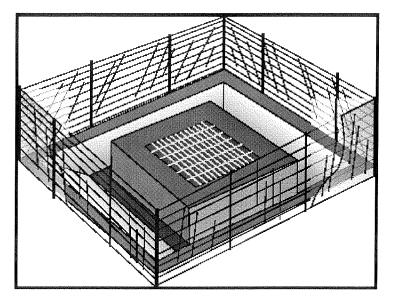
Storm drain Inlet Protection with Silt Fence and Excavated Sediment Traps
